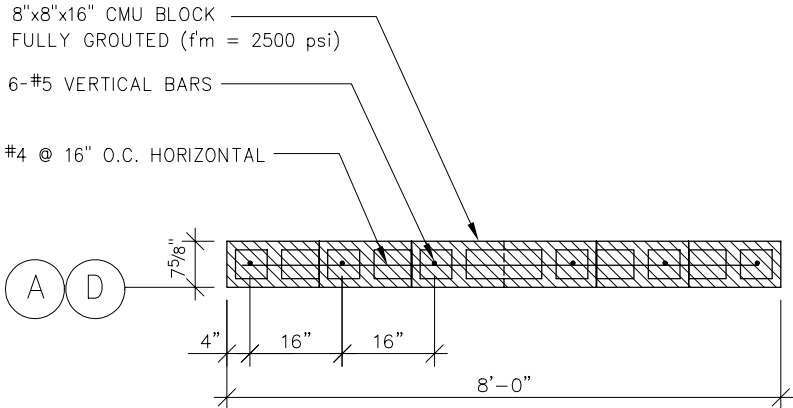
Reinforcement in 8'-0" CMU shear walls on lines A and D
